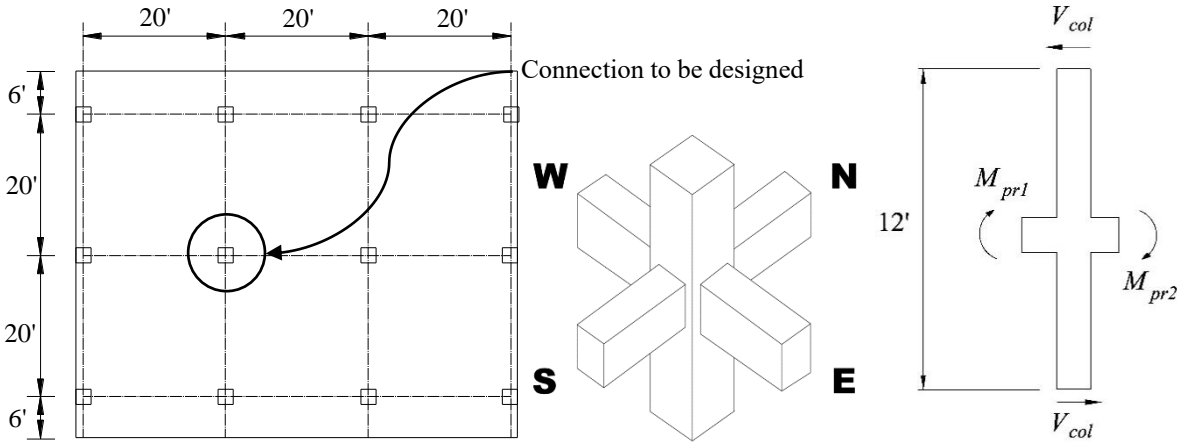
(a) Floor plan (b) Joint outline (c) Column side view
